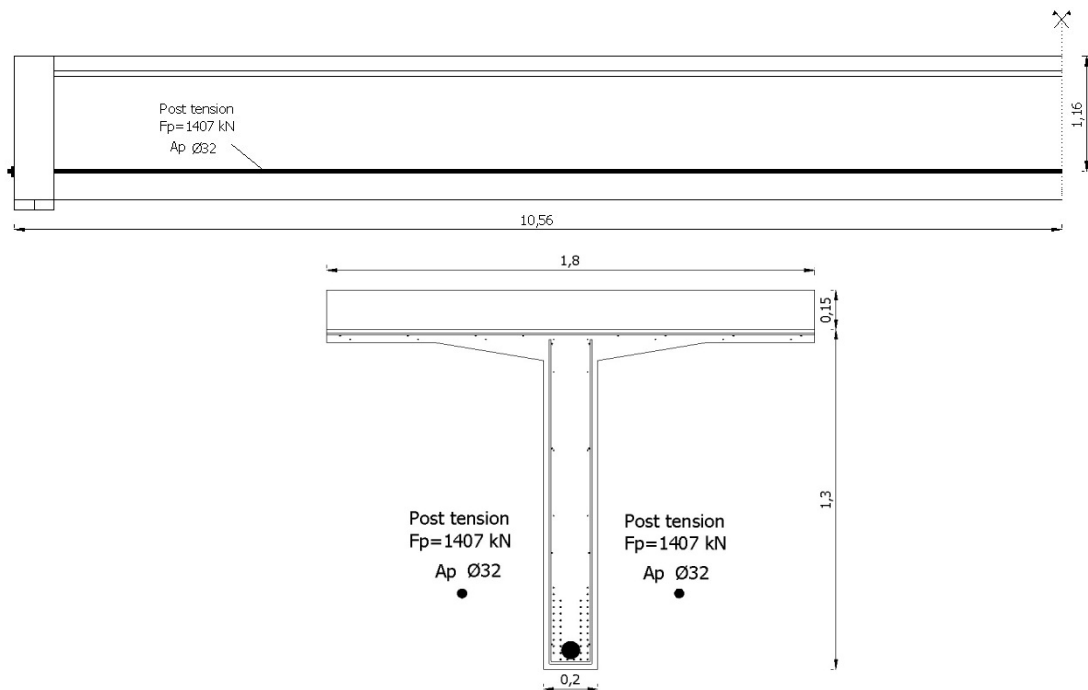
Strengthening proposal of the Wassnerwald bridge by post-tensioned longitudinal reinforcement
